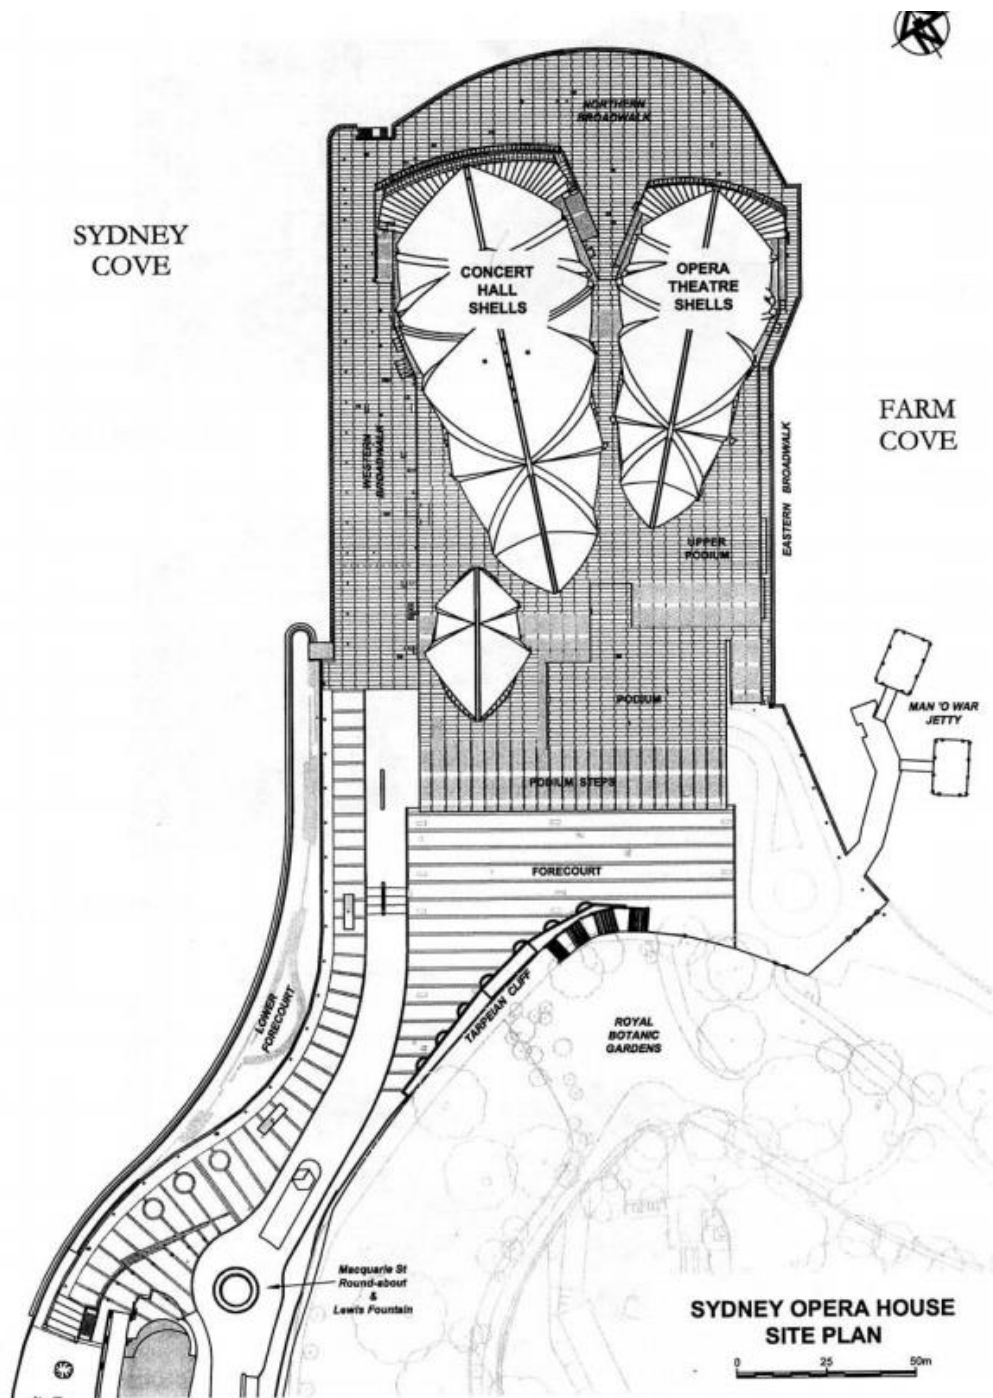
Sydney Opera House Site Plan [source: Sydney Opera House Conservation Management Plan]
